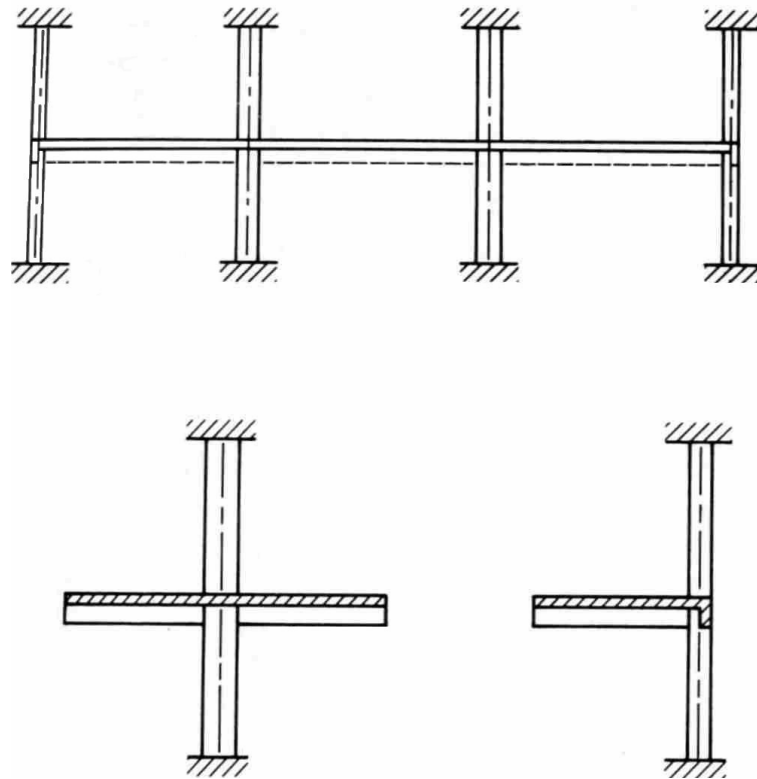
Elevation and sections of equivalent frames: at the top elevation of frame cut from slab structure, at the bottom on the left cross section of interior frame and on the right cross section of edge frame
